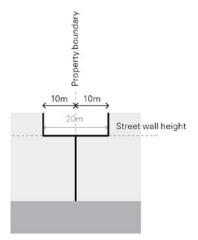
Side and rear setbacks above the street wall. These side and rear setbacks apply if the building below the street wall is built to the boundary
